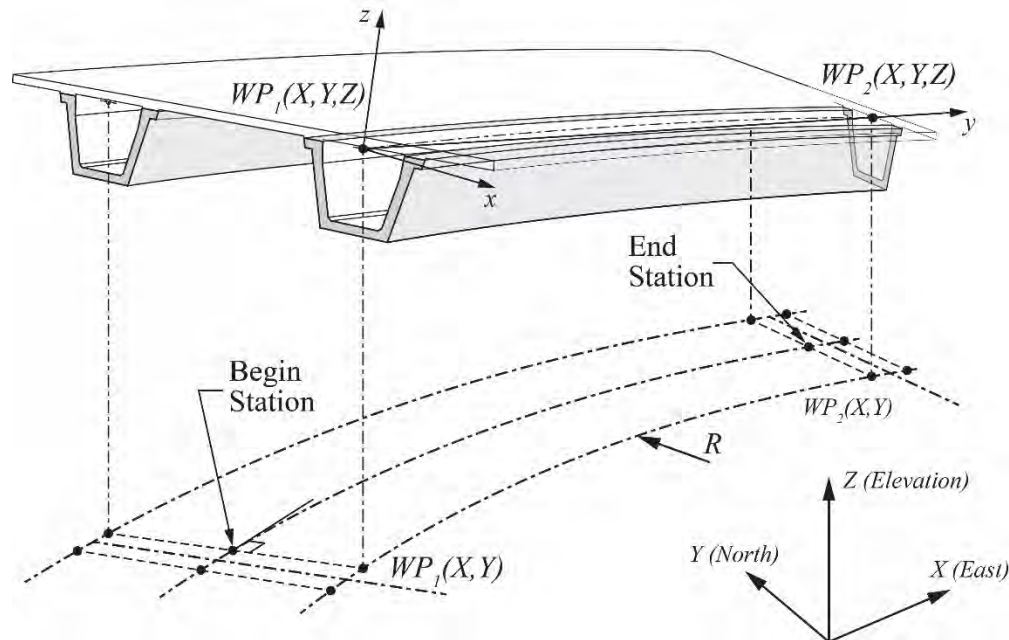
Plan View Layout of a Two-Girder Bridge with Equal Girder Radii
